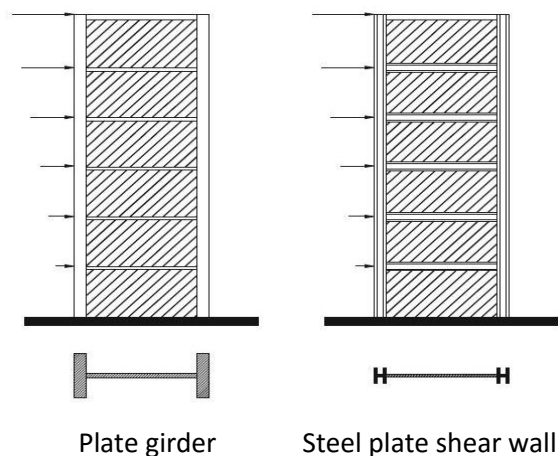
Typical plate girder and steel plate shear wall (Mahtab and Zahedi, 2008)
